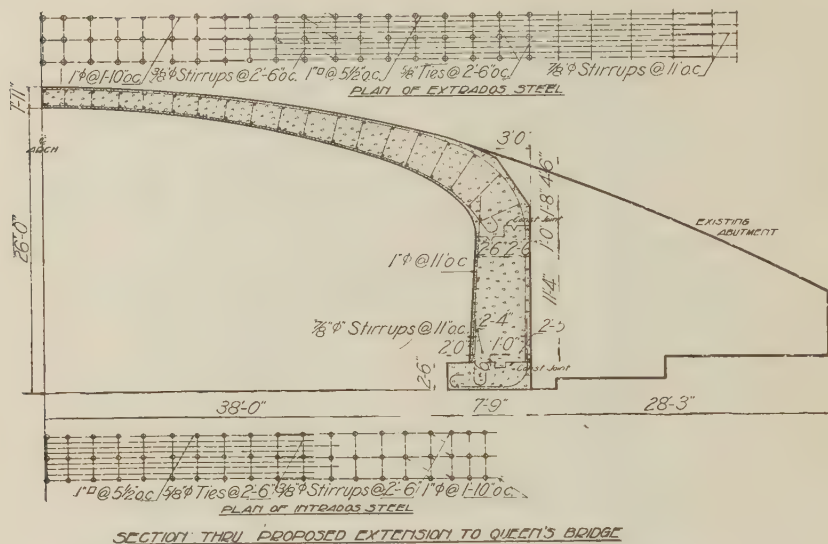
SECTION OF PROPOSED BRIDGE EXTENSION
